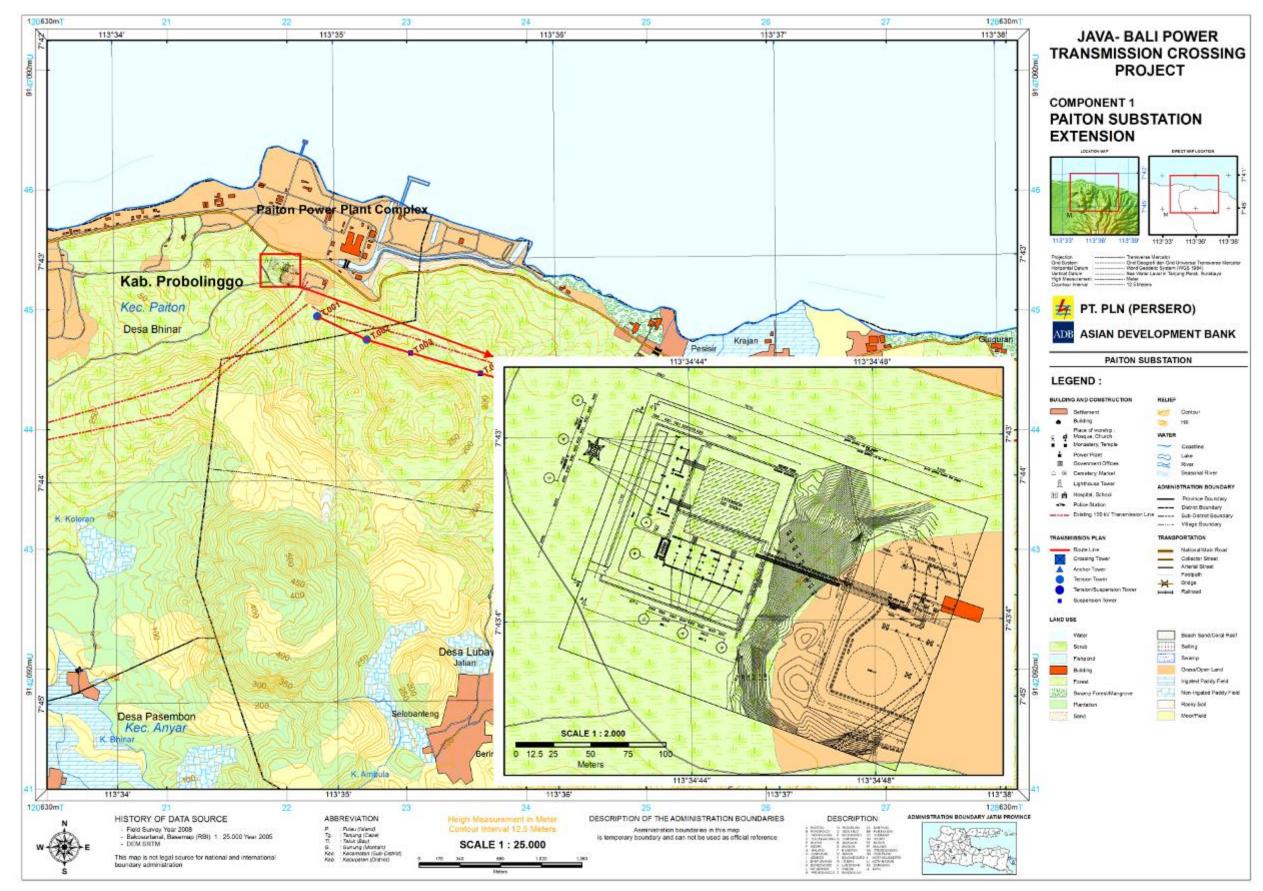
Proposed Paiton Substation expansion location and layout plan, Component 1
